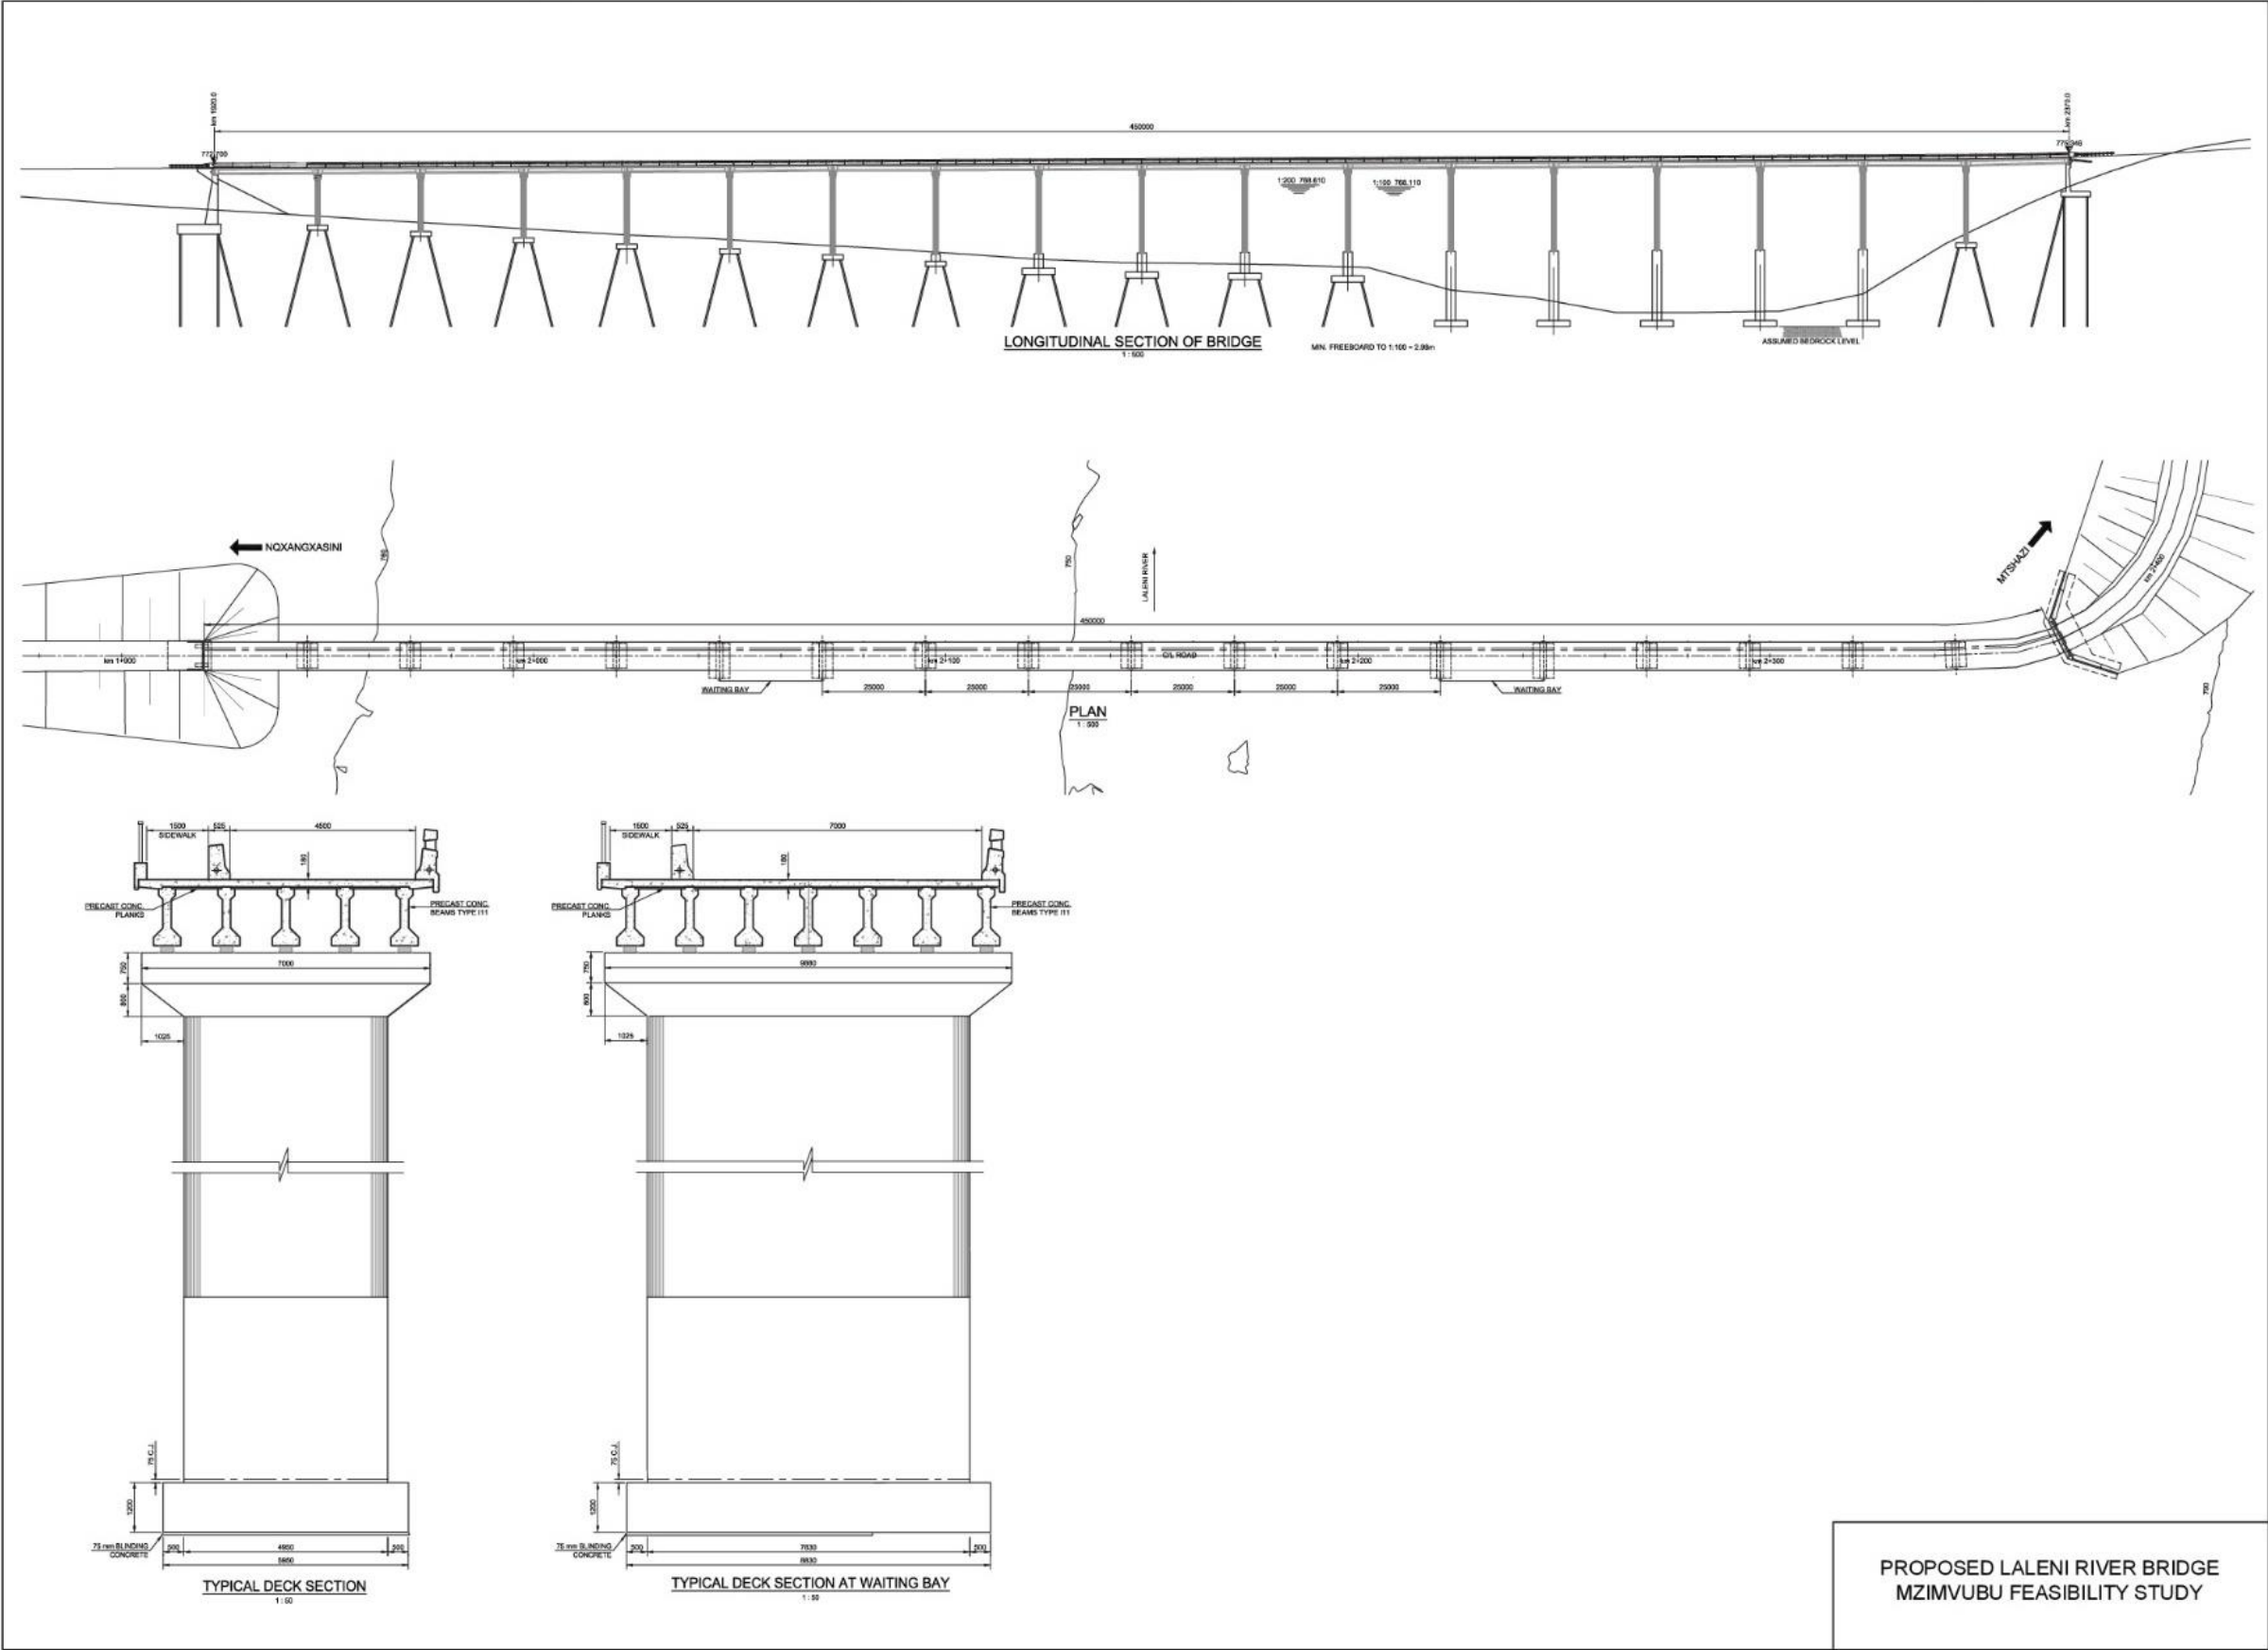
Proposed Lalini Bridge over Inundated River Section
